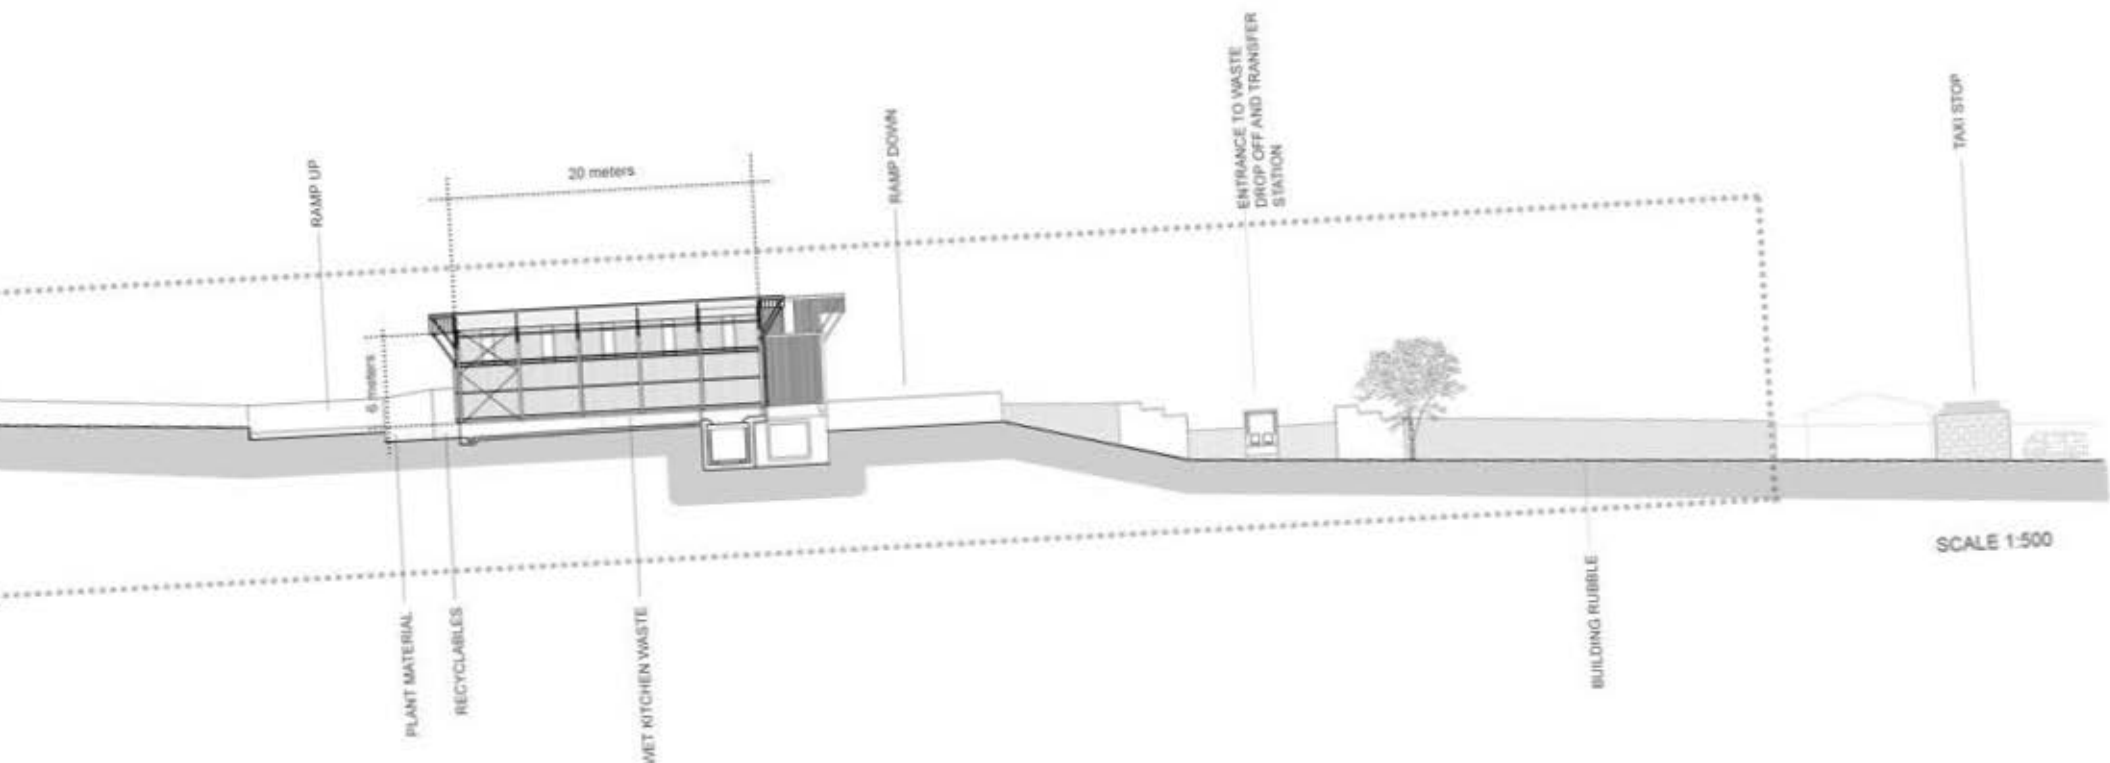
Sections through existing Kleinmond Waste Drop-off and Transfer Station.
